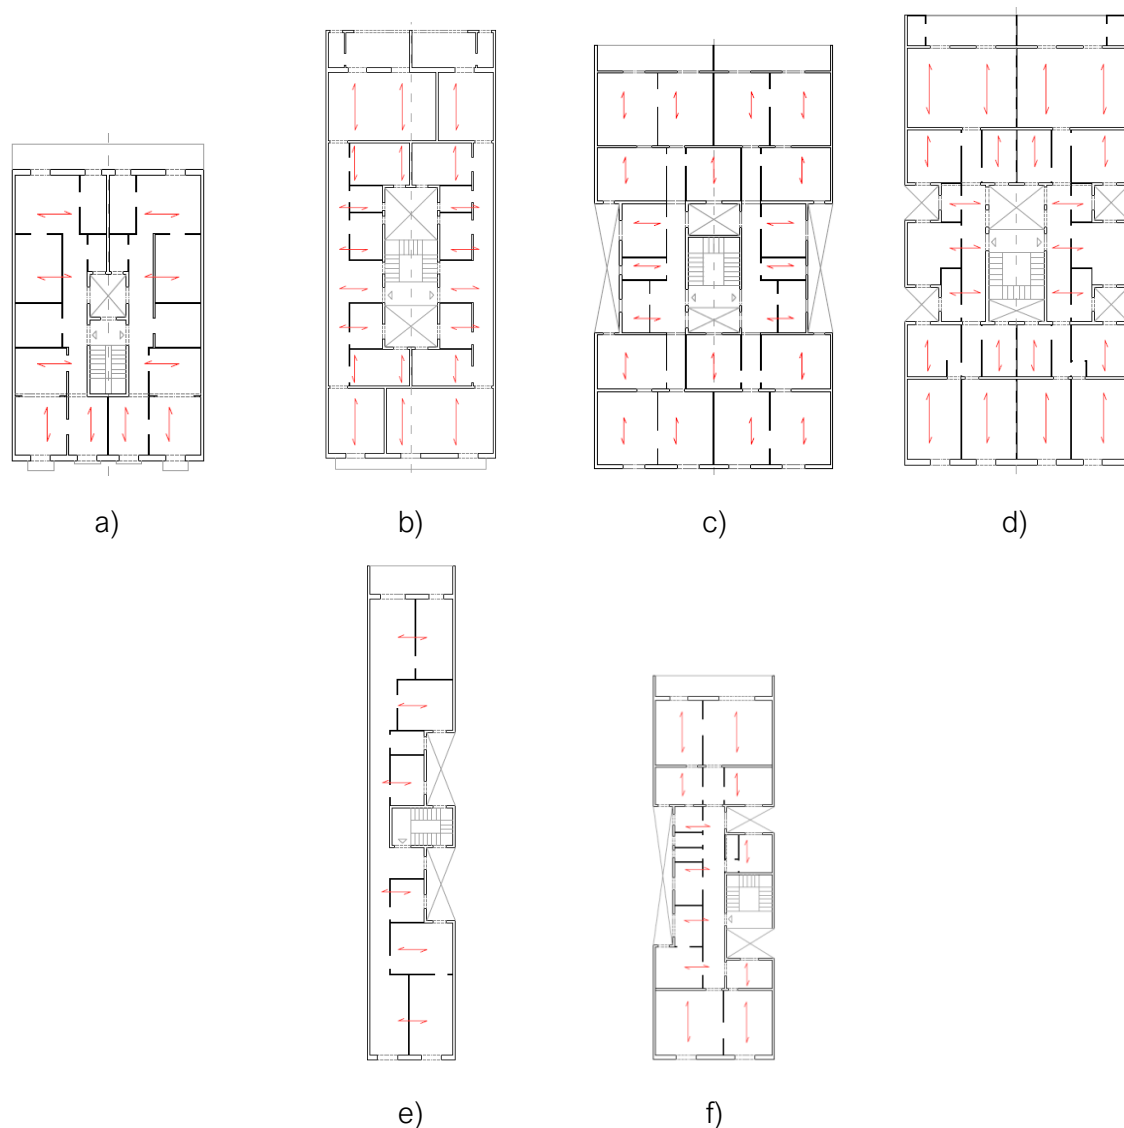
Different configurations of typical rectangular buildings in Eixample district: a) rectangular building with a central staircase and patio; b) wide rectangular building with a central part composed of two interior patios and a central staircase; c) wide irregular building with a central part composed of central staircase and patios, as well as lateral patios on each longitudinal load-bearing walls; d) wide irregular building with a central part composed of central staircase and patios, as well as two or more lateral patios on each longitudinal load-bearing walls; e) narrow building with a lateral staircase placed transversally along the building's plan and lateral patios; and f) narrow building with a lateral staircase placed longitudinally along the building's plan and lateral patios (Cornadó Bardón, 2015).
